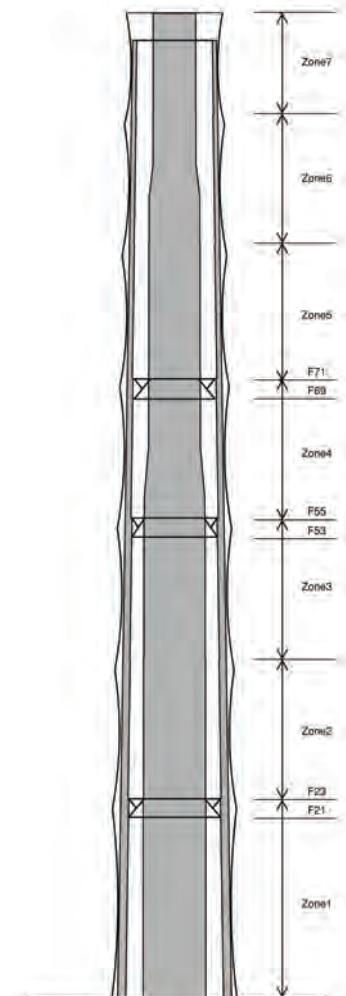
Tower outrigger elevation (Source: Thornton Tomasetti)
